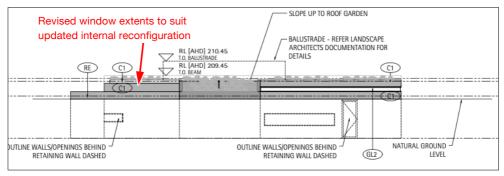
Proposed south elevation. Note that most of the building is below natural ground level.
